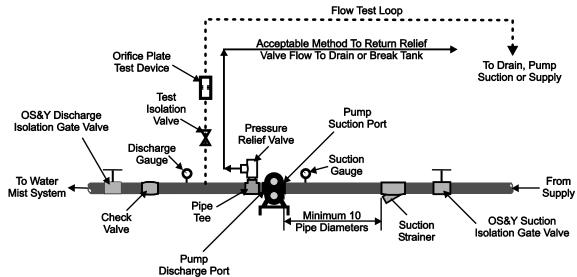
Typical Water Mist System Pump Piping and Fittings
